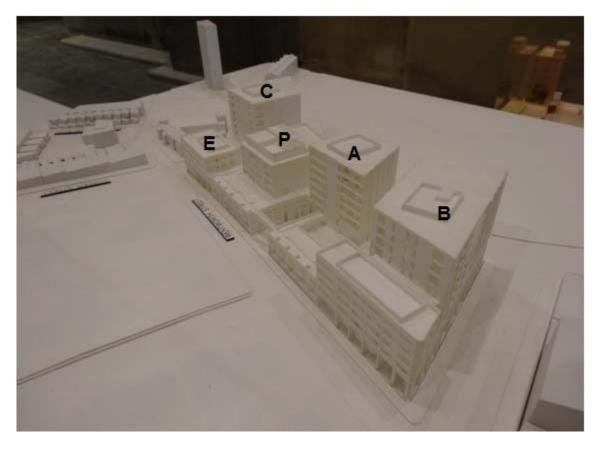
Model view looking towards the north-west. The respective towers A, B, C, E & P denoted.
